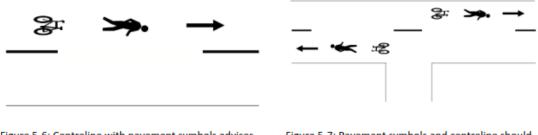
Centreline with pavement symbols advises path users to keep left. Figure 5-7: Pavement symbols and centreline should be located adjacent to path access points
